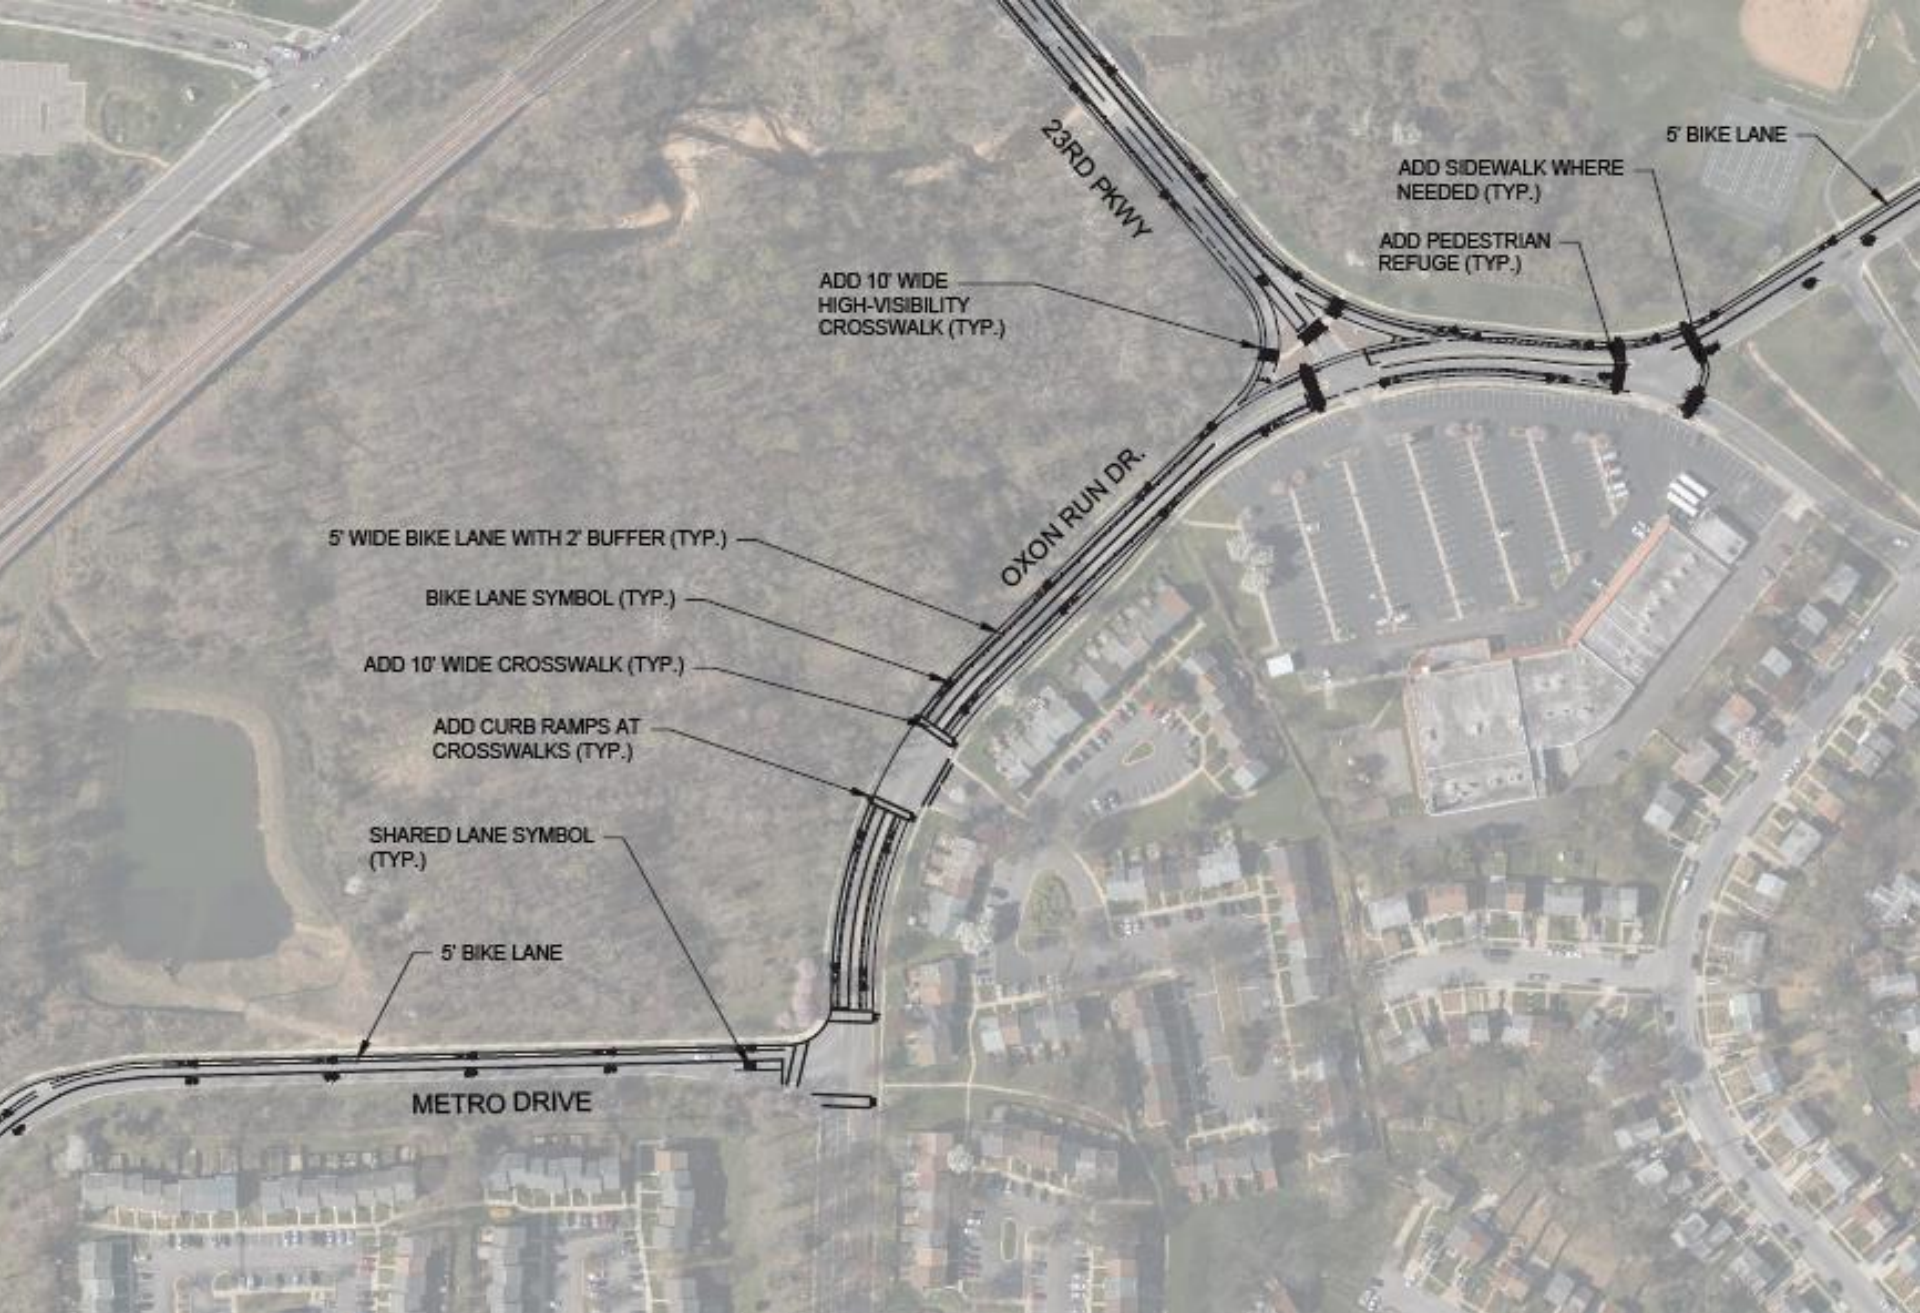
Plan View of Proposed Trail Concept Connecting the Hillcrest Towne community to the Southern Avenue Metrorail Station (Project #19)
